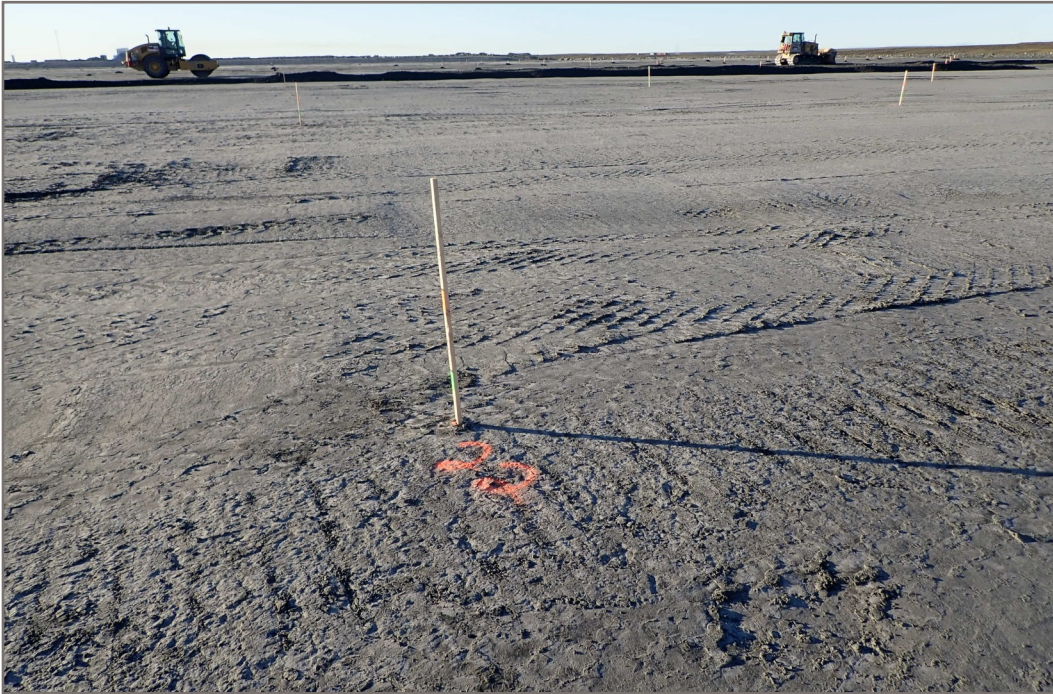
TSF—Tailings surface, grade stakes used for lift control
